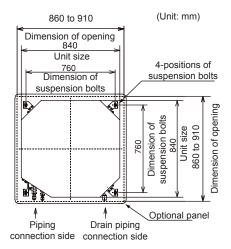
Opening of False Ceiling and Suspension Bolts
